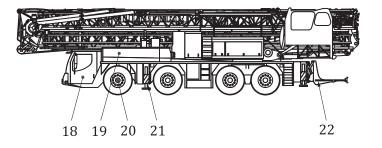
Bottom slewing with horizontal jib and telescoping tower
